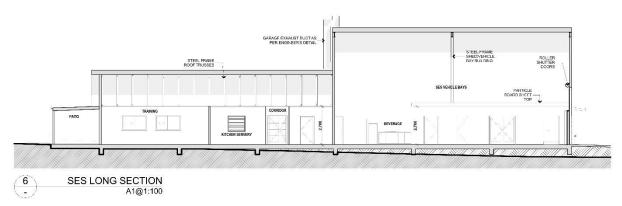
B: DA approved floor level and building height (source: F&J Tepa)
